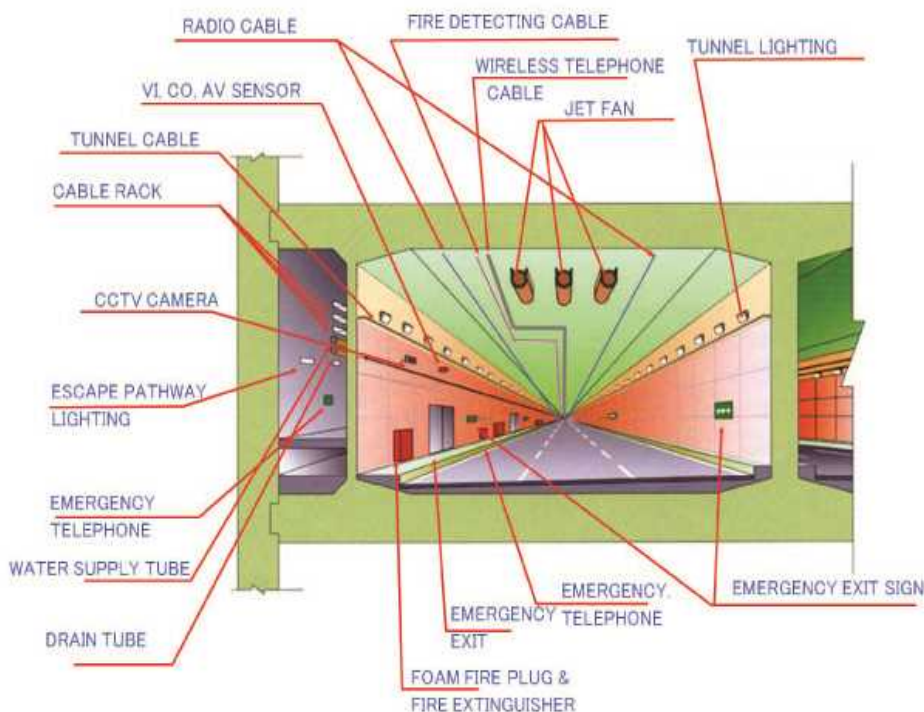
Example Layout of Tunnel E&M Facilities
